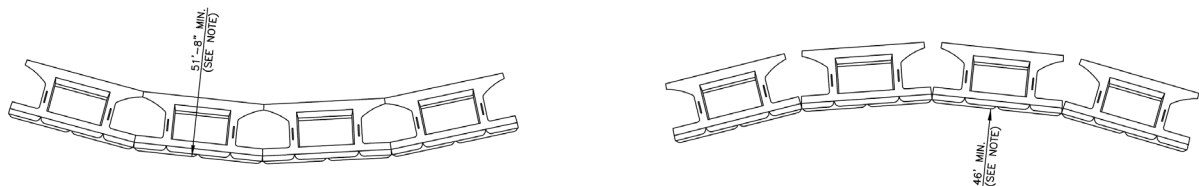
24SF & 6SF Unit Dimension & Taper
